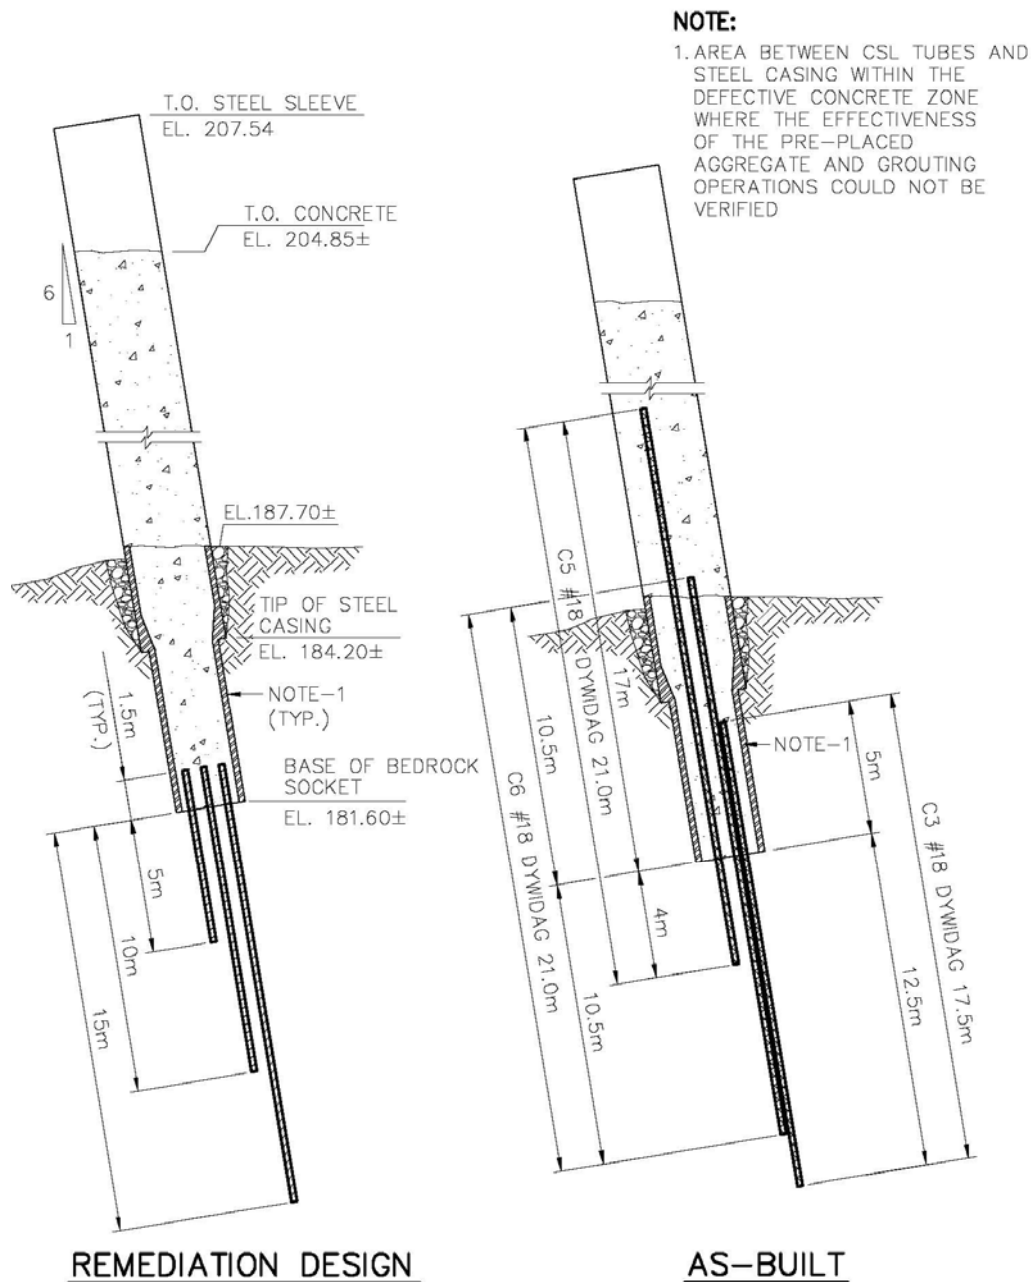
Dywidag installation details to transfer vertical and lateral loads from the sound concrete in the caisson to the underlying bedrock.
